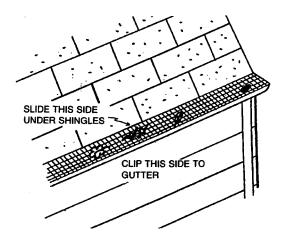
Gutter guard. (Source: Midwest Plan Service, Iowa State Univ. 1968. Private Water Systems p. 14)
